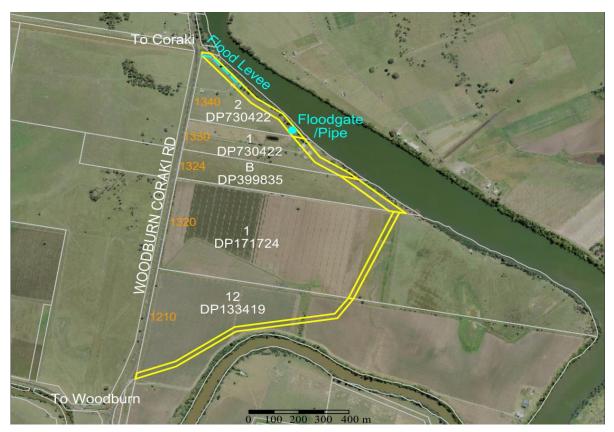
Plan showing proposed road outlined yellow, flood mitigation infrastructure shown in cyan.
